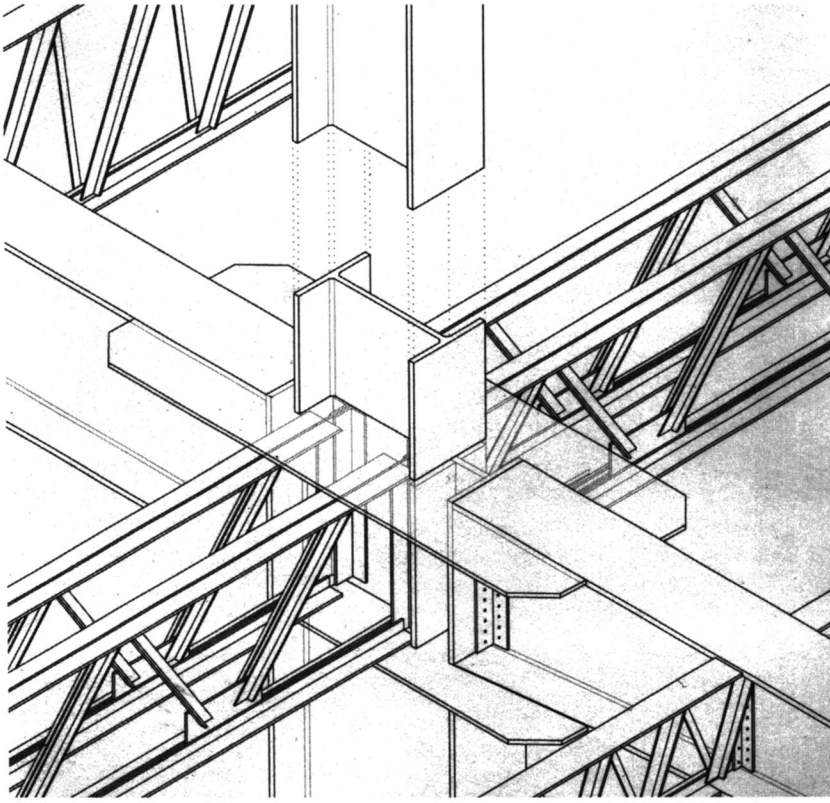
CAF, axonometric projection of post-beam assembly. Drawing Giulia Marino.
